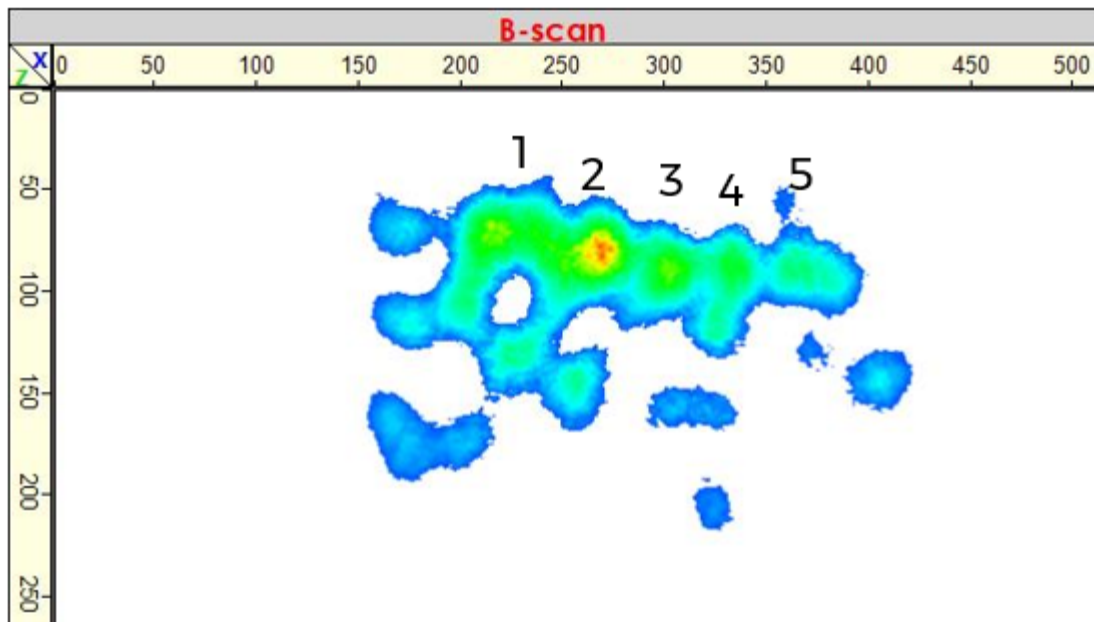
MIRA B-Scan showing 5 Prestressing Strands (BR04131)
